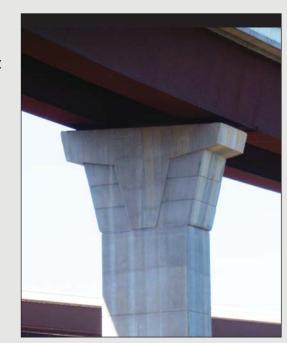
Typical Hammerhead Bent with Rectangular "Longhorn" Column
